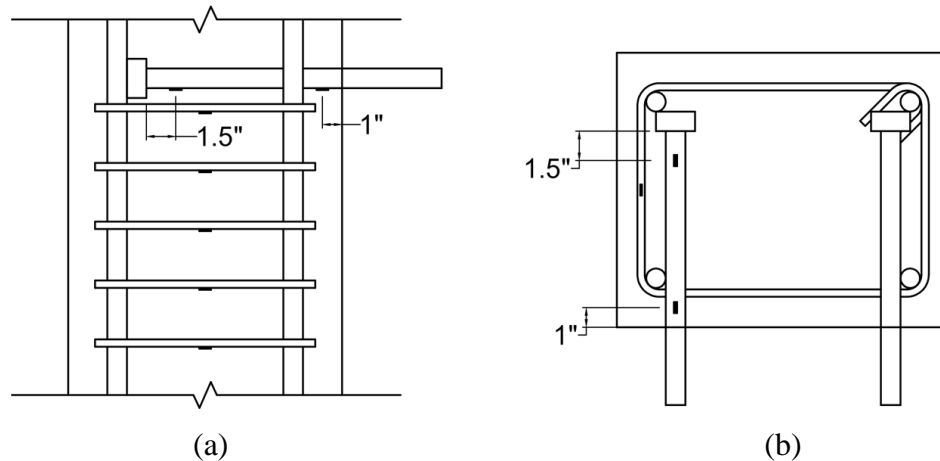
Strain gauge locations (a) side view, (b) top view
